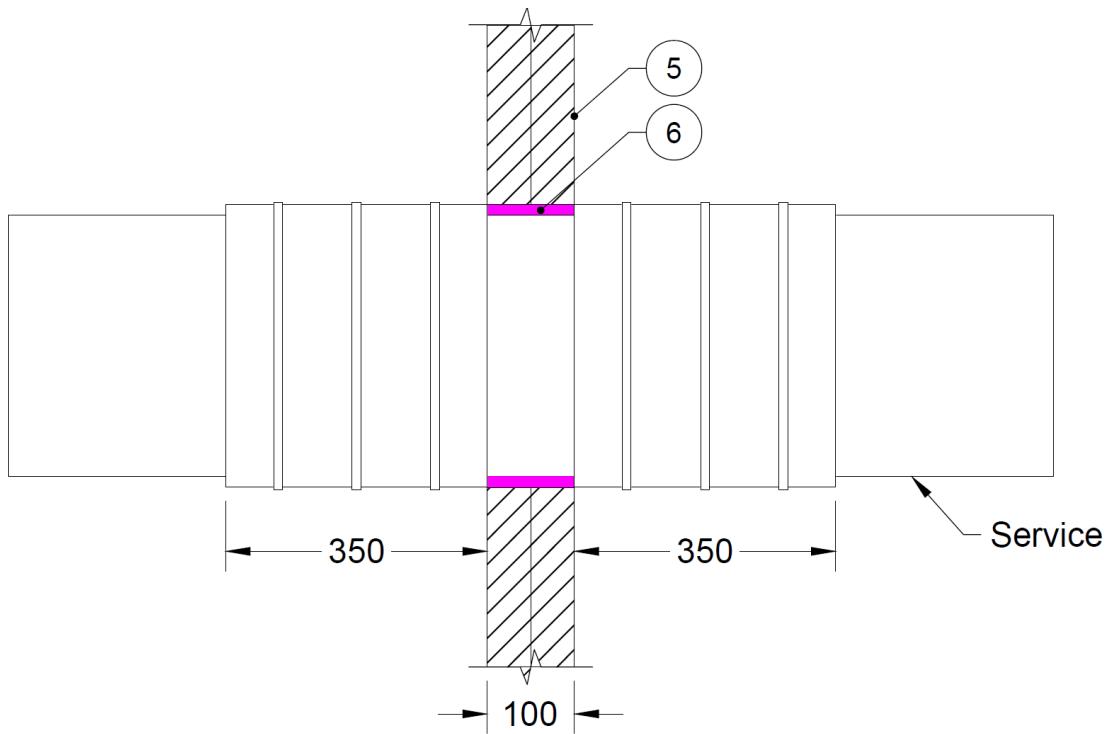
Section View of Cables and Pipes Installed in Vertical Substrates
